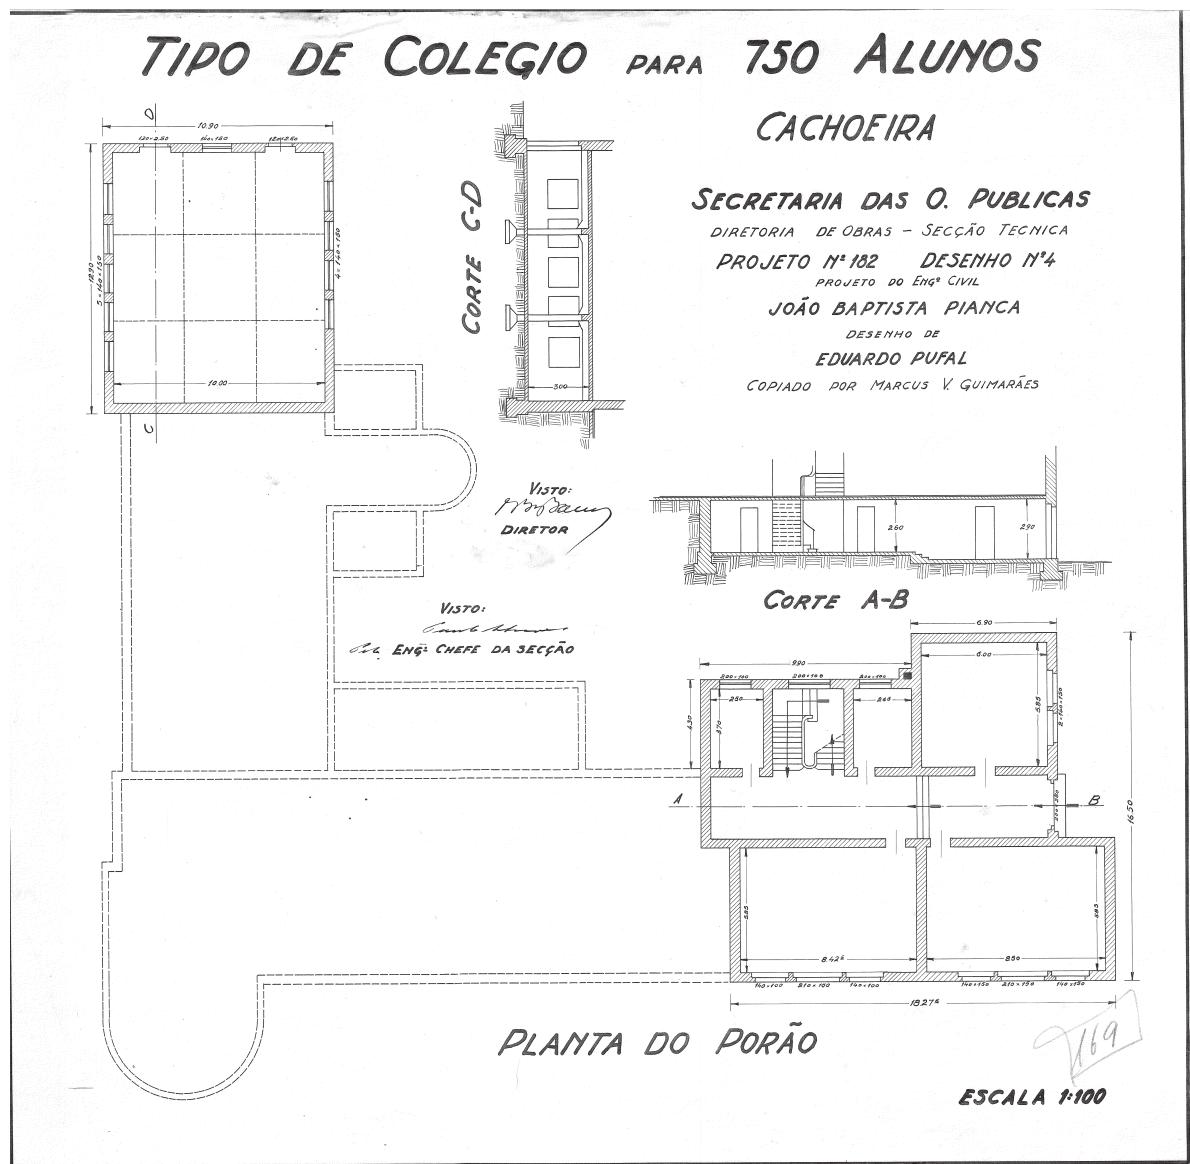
Floor plan of the basement of the João Neves Da Fontoura I. E. E. School.
